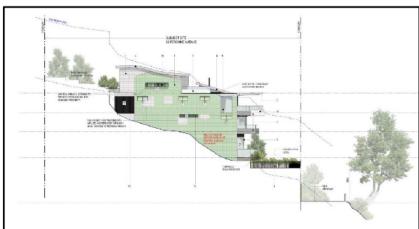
Extract of West Elevation (Source: Squillace Architects)
